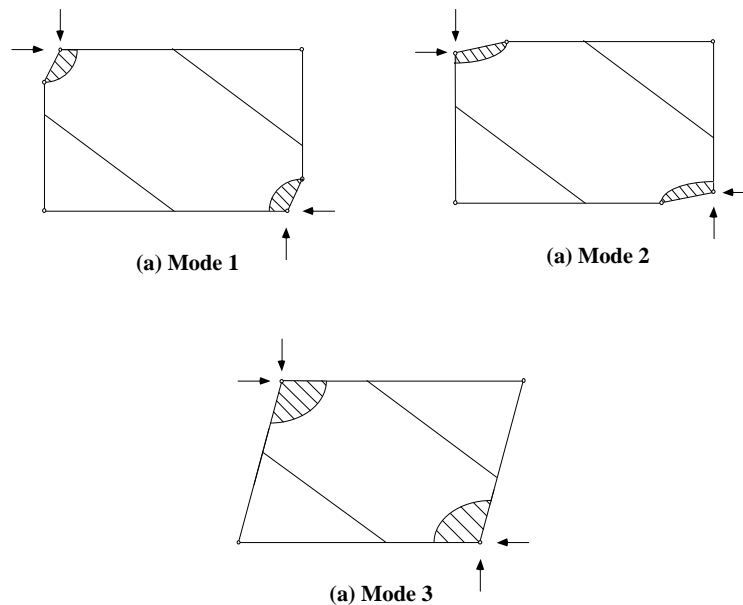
Collapse modes for infilled frames (Liauw and Kwan)
